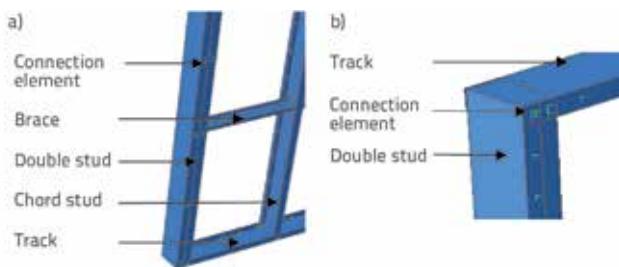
SWP details: a) Framing elements; b) chord-stud-to-track connection
